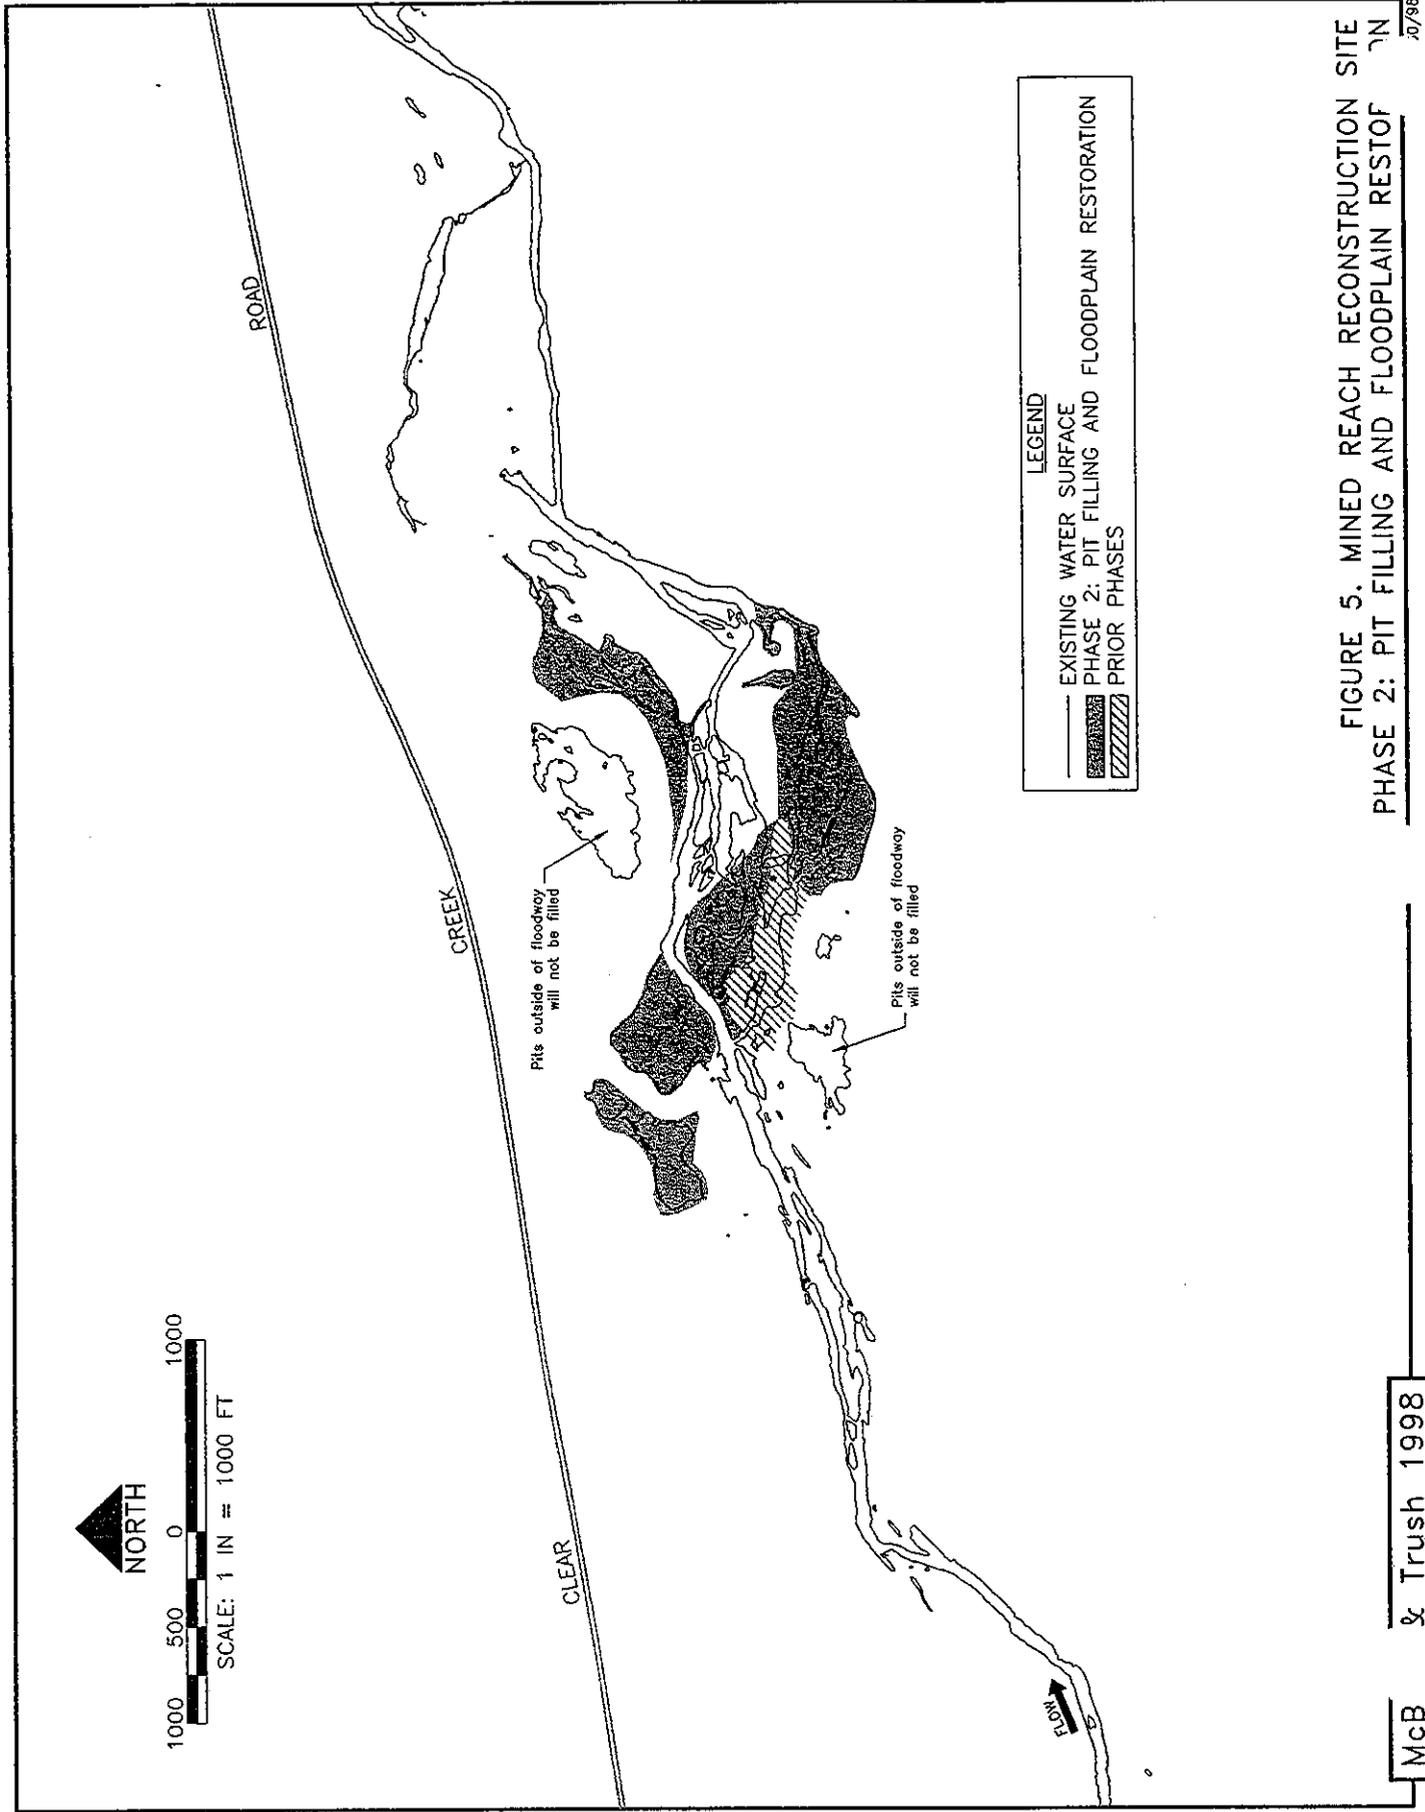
MINED REACH RECONSTRUCTION SITE
